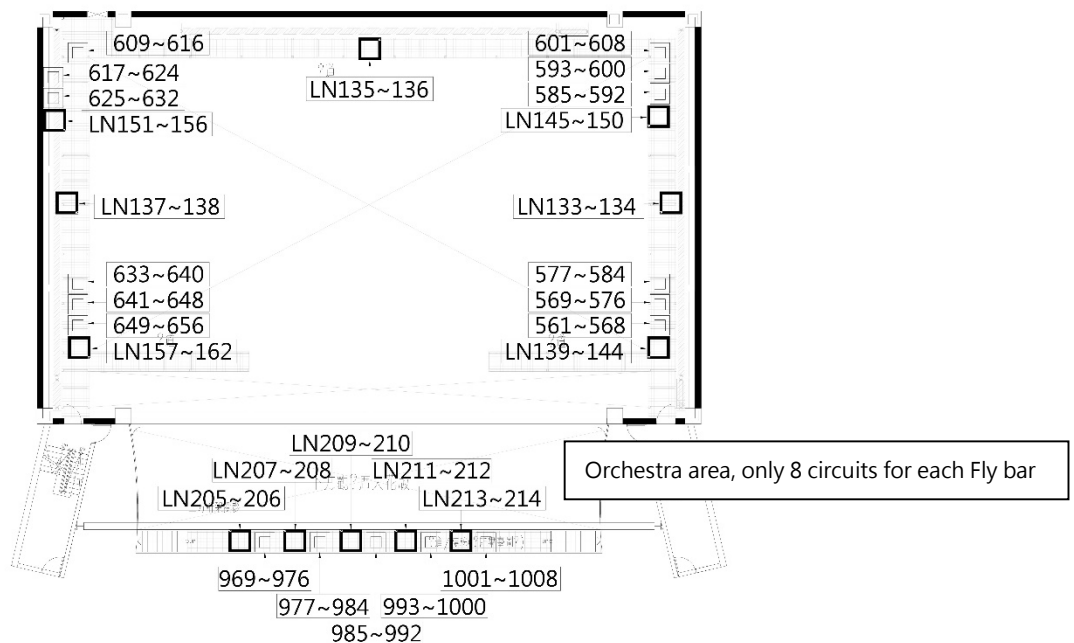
Orchestra Pit Overhead and R1F Gallery Lighting Circuit Layout
